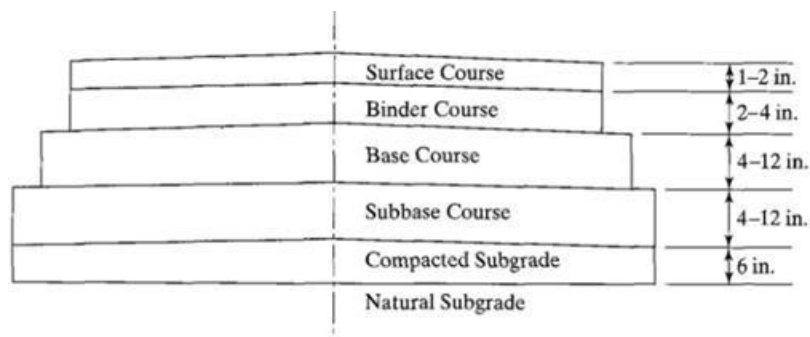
Typical Cross Section of a Conventional Flexible Pavement (Huang, 1993)
